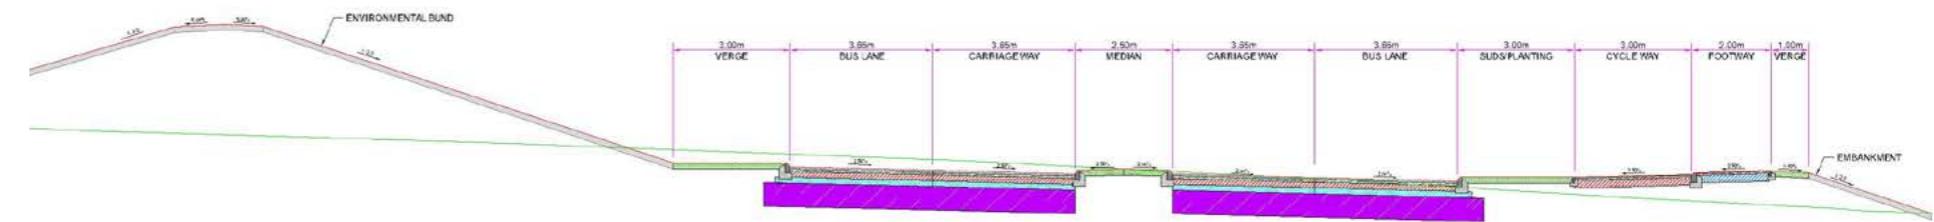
Crawley Western Multi – Modal Corridor Typical Cross-Section (North of the River Mole Bridge)
